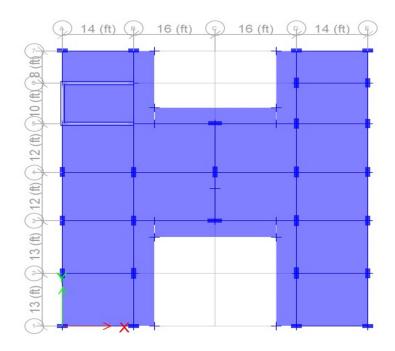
Plan view of (G+12) storied commercial building for Plan 03
